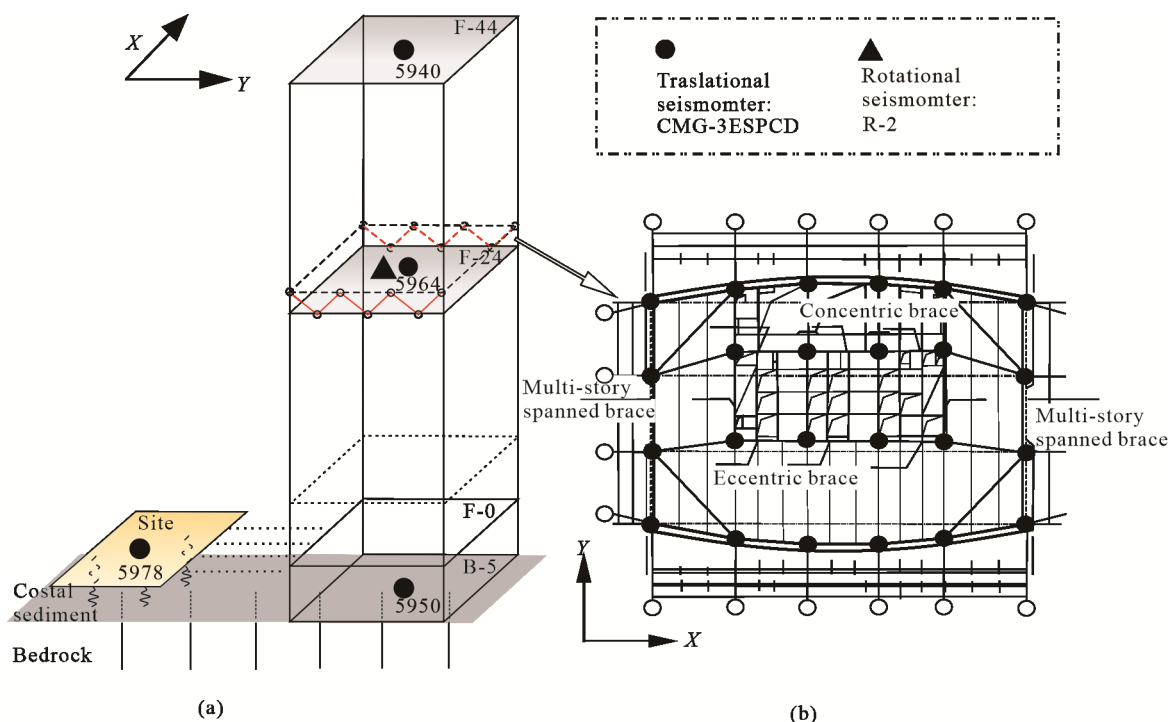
Sketch showing the basic information for the high-rise building (Du et al., 2012). (a) Instrument layout, the red line shown on the 24th floor represents the Y-oriented horizontal steel frame on the refuge floor. (b) Standard floor structure plan.
